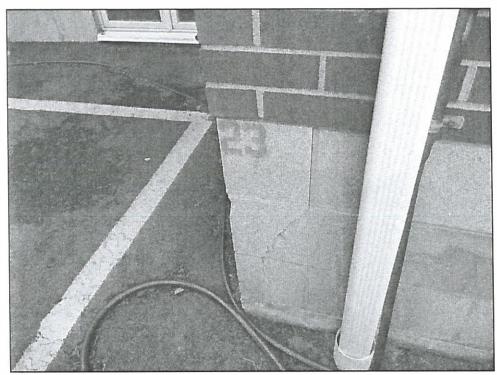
Corner Spalling at Foundation of the Original Building
